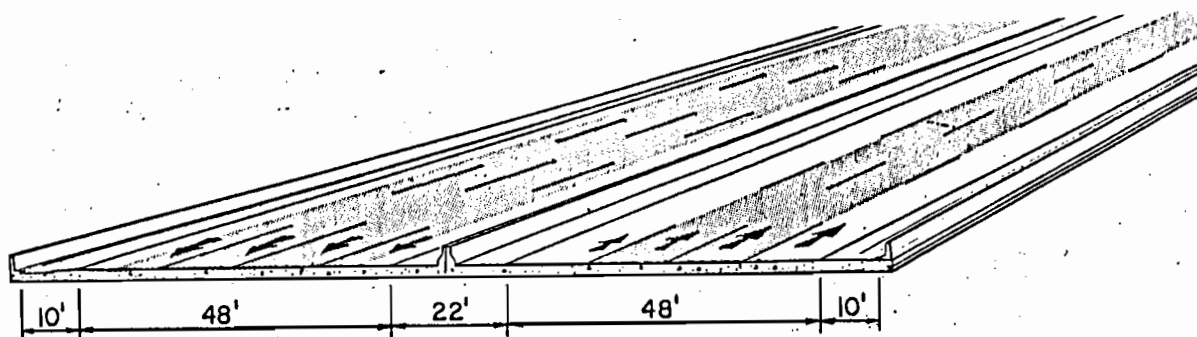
DALE MABRY BRIDGE OVER HILLSBOROUGH AVE
